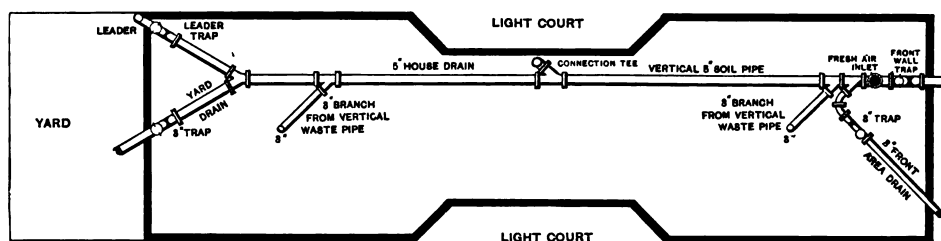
Cellar Plan, Showing House Drain and Connections.
